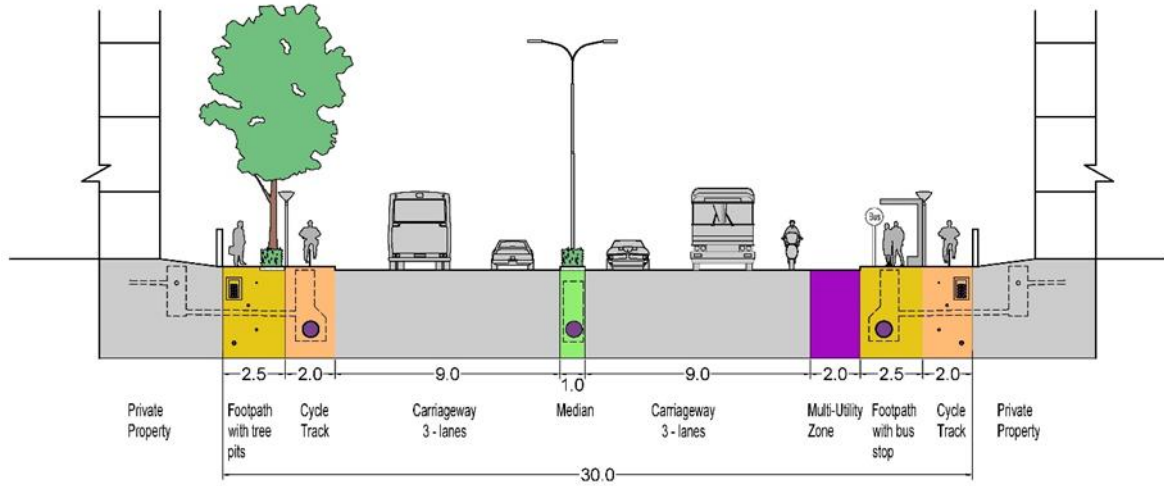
TYPICAL SECTION OF 30M WIDE ROAD
